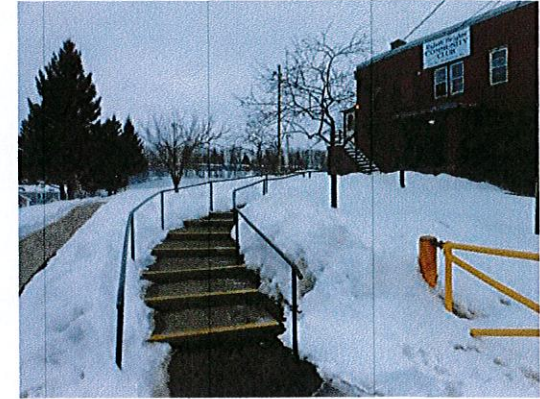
An accessible route to a side entry is provided adjacent to the stairs leading to the upper level.
